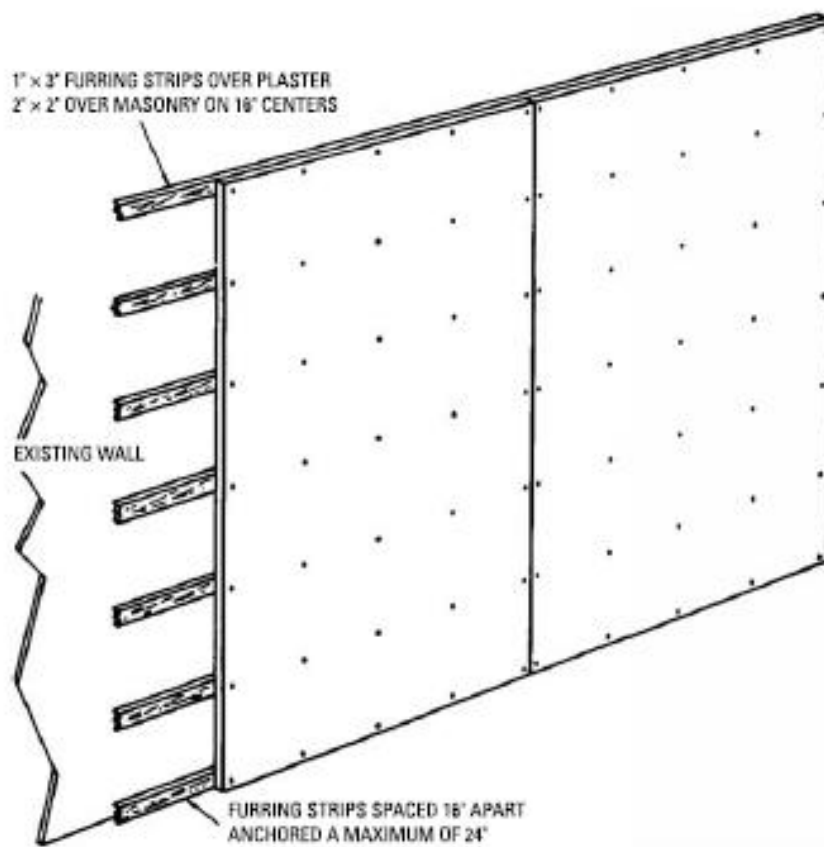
Wood furring strips installed over solid masonry or old existing walls. (Courtesy National Gypsum Co.)
